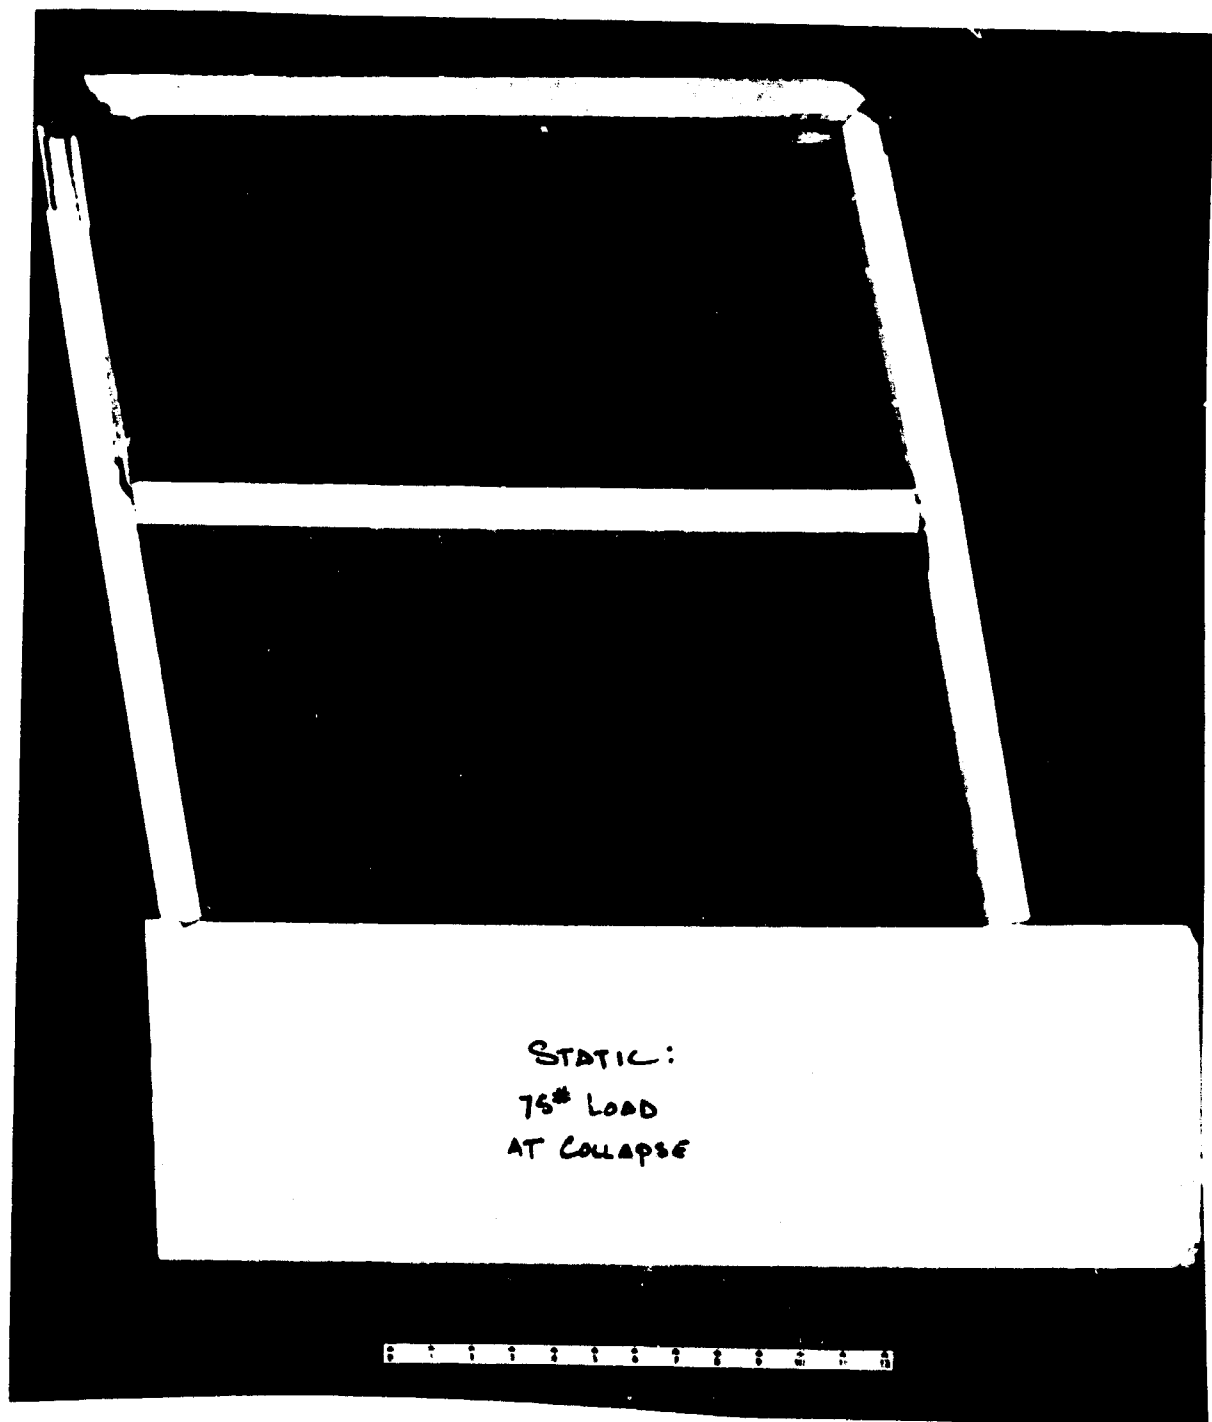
STATIC COLLAPSE, TWO-STORY FRAME
